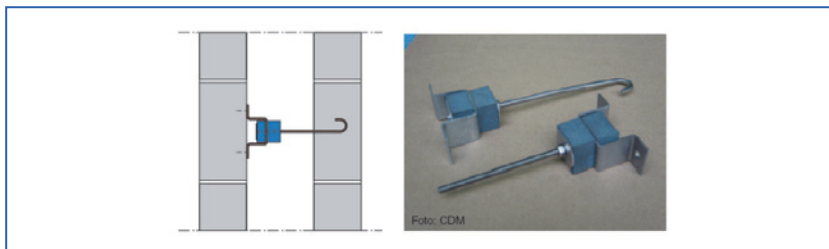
Solutions to connect “waiting walls” to the first built house.
